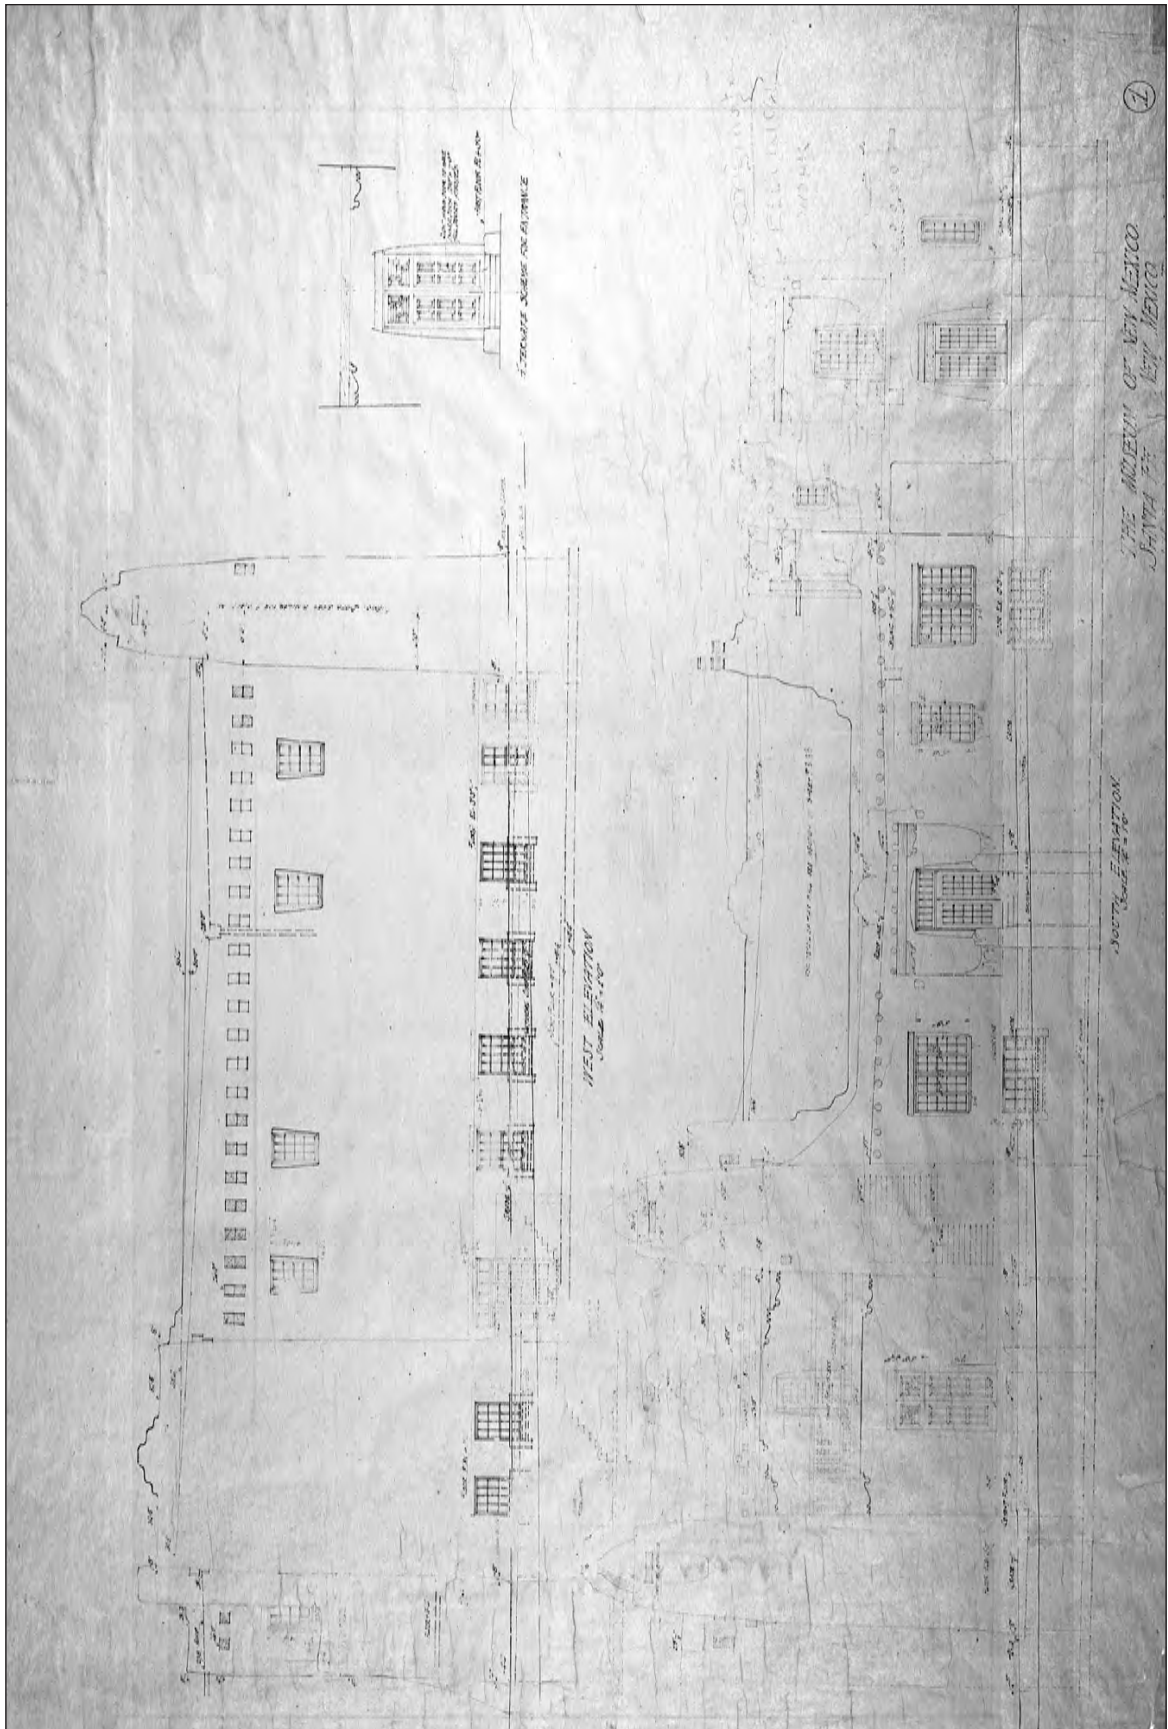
Architect's west and south elevations of the Museum of Art construction plans.
